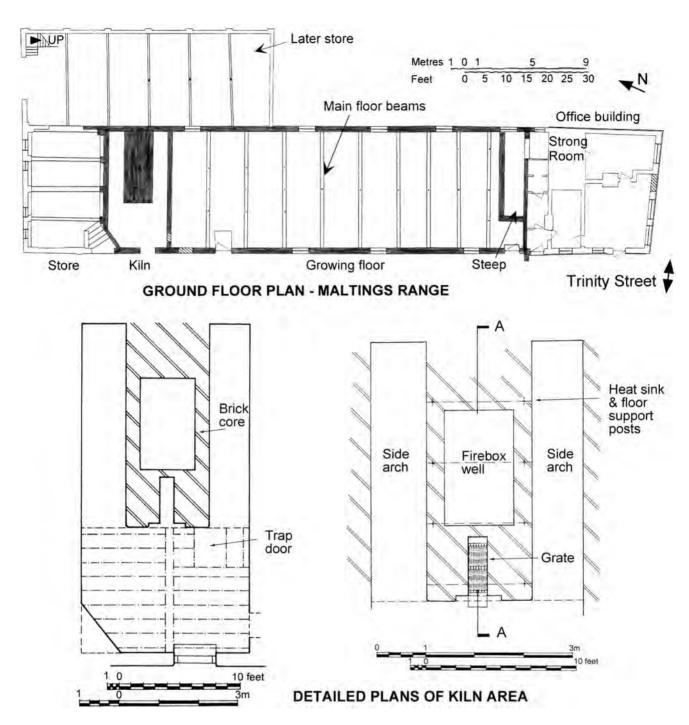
Halstead, Adams Brewery, ground floor plan of the malting range, with plans of the kiln area
